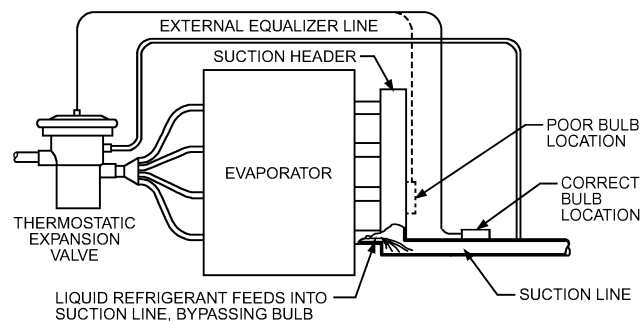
Bulb Location for Thermostatic Expansion Valve
